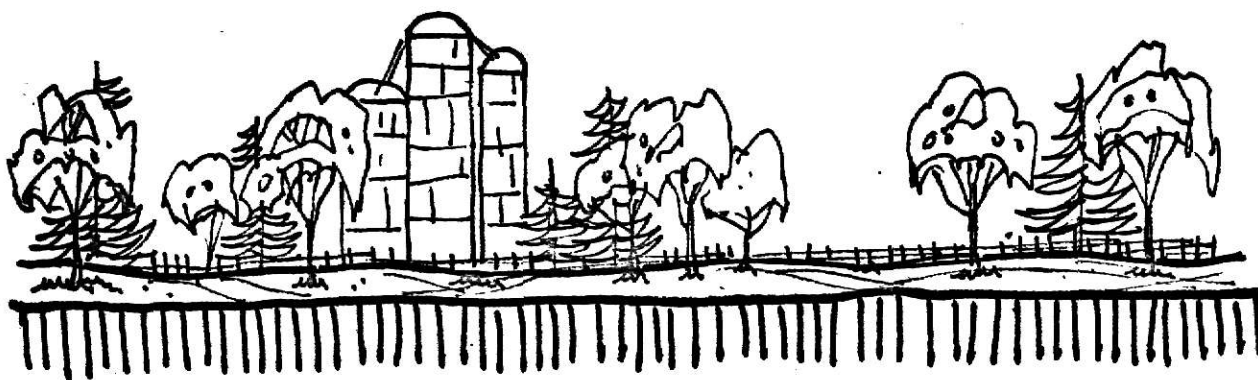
Section of Perimeter 'buffer' Zone Planting.
